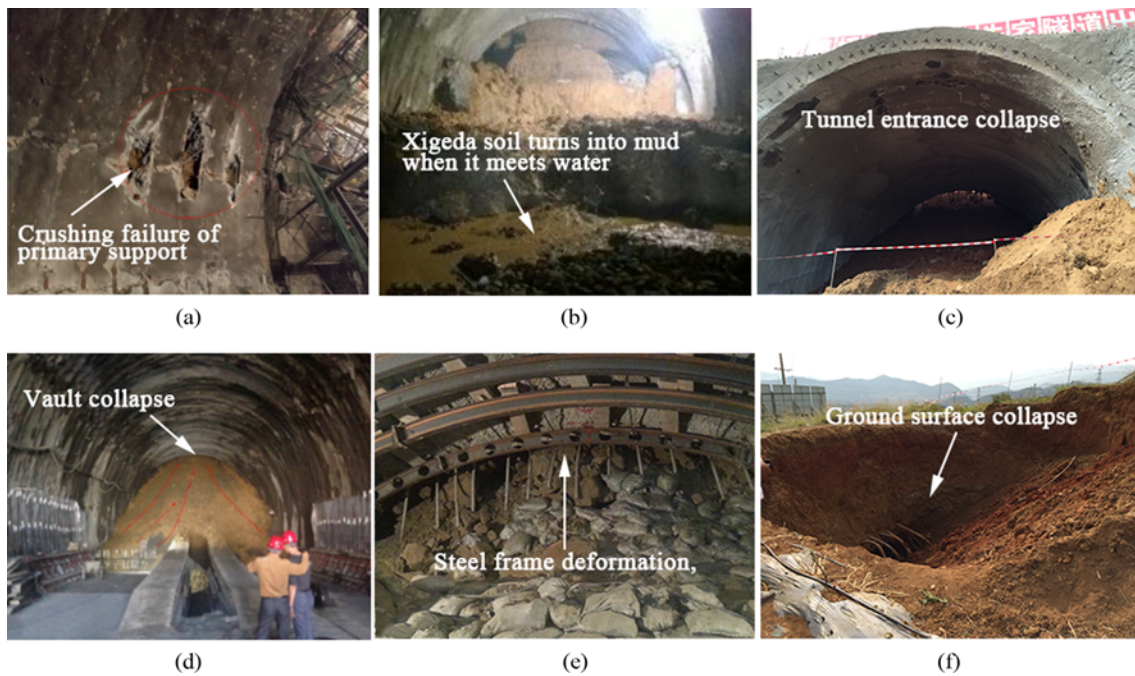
Tunnel Engineering Disaster in Xigeda Formation: (a) Crashing Failure of Primary Support, (b) The Mudding of the Tunnel Face, (c) Tunnel Entrance Collapse, (d) Vault Collapse, (e) Steel Frame Deformation, (f) Ground Surface Collapse
